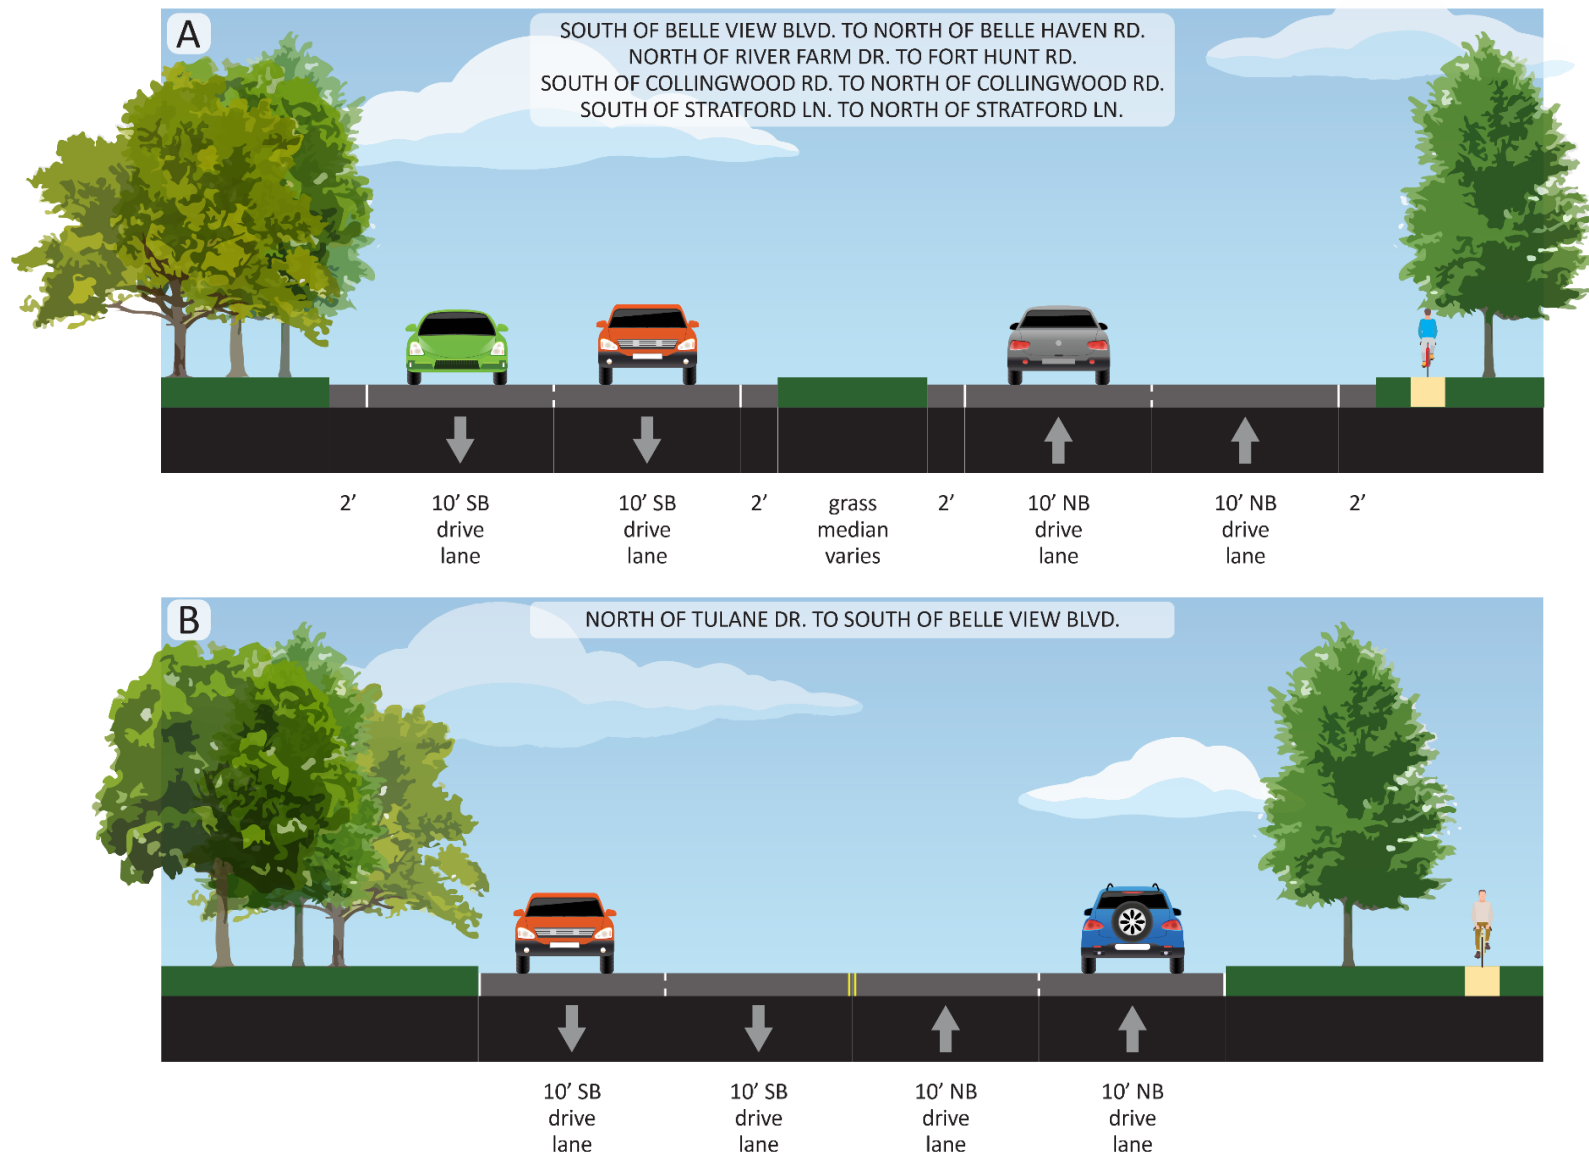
The Parkway's Existing Typical Roadway Sections (continues on next page)
